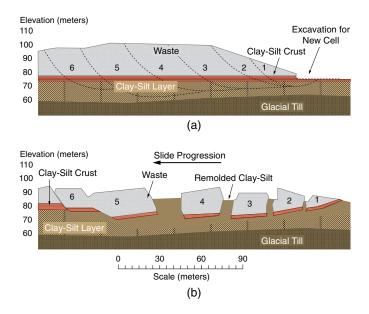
(Color) Crossroads Landfill: (a) condition prior to failure showing overconsolidated clay–silt crust transitioning to underlying normally consolidated clay–silt layer and excavation of the crust at the western toe; and (b) condition after failure with intact MSW blocks and crust material displaced on the remolded clay–silt layer. (Reproduced from Reynolds 2015, with permission of University of Maine.)
